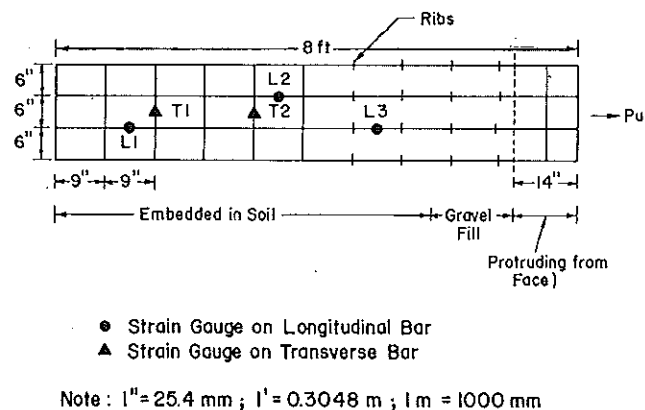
Typical Dummy Mat Used in the Field Pullout Tests
